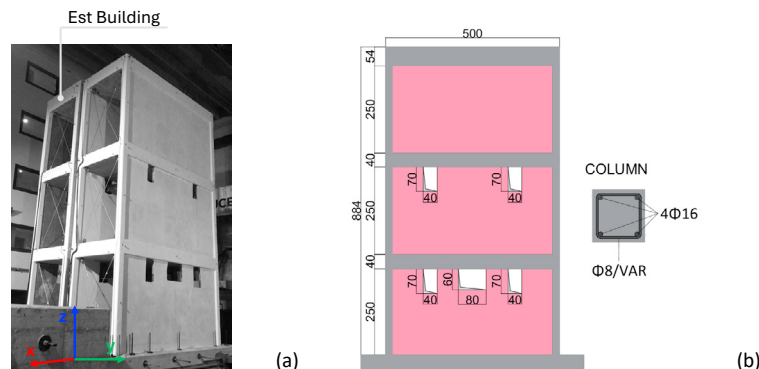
Overview of the reference specimen and structural details: (a) Full-scale twin buildings of the reference experimental campaign; (b) Geometry and column reinforcement layout.
